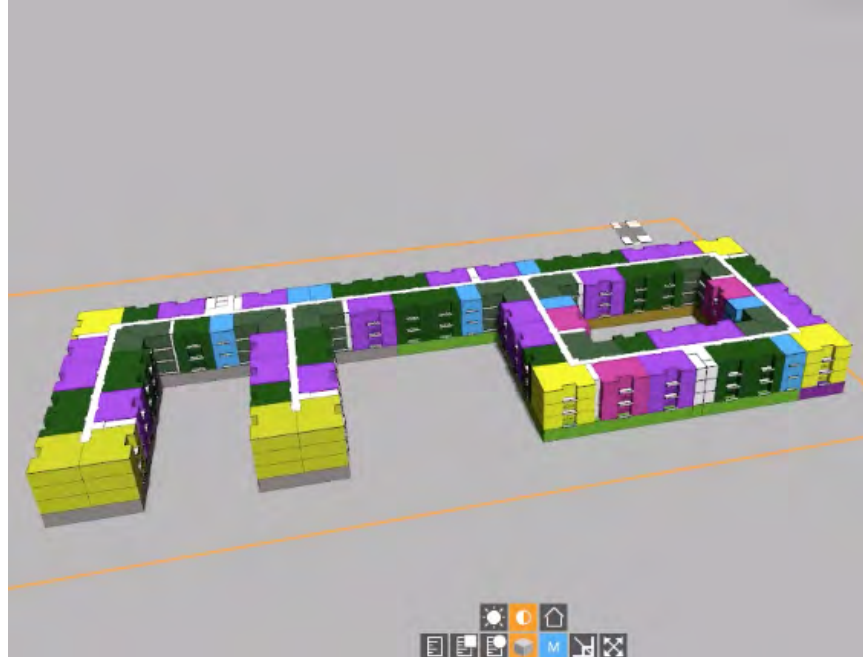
TestFit generated site plan for The Gallery at Goodwin
